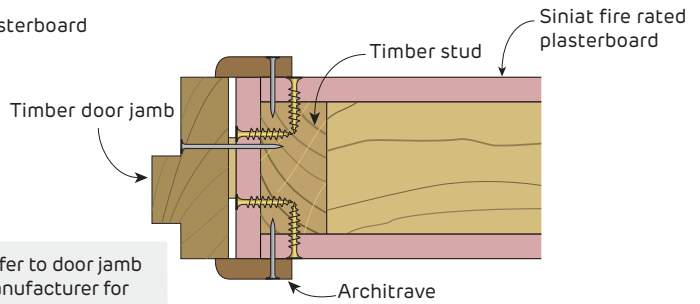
Typical Fire Rated Door Jamb Example only Plan
